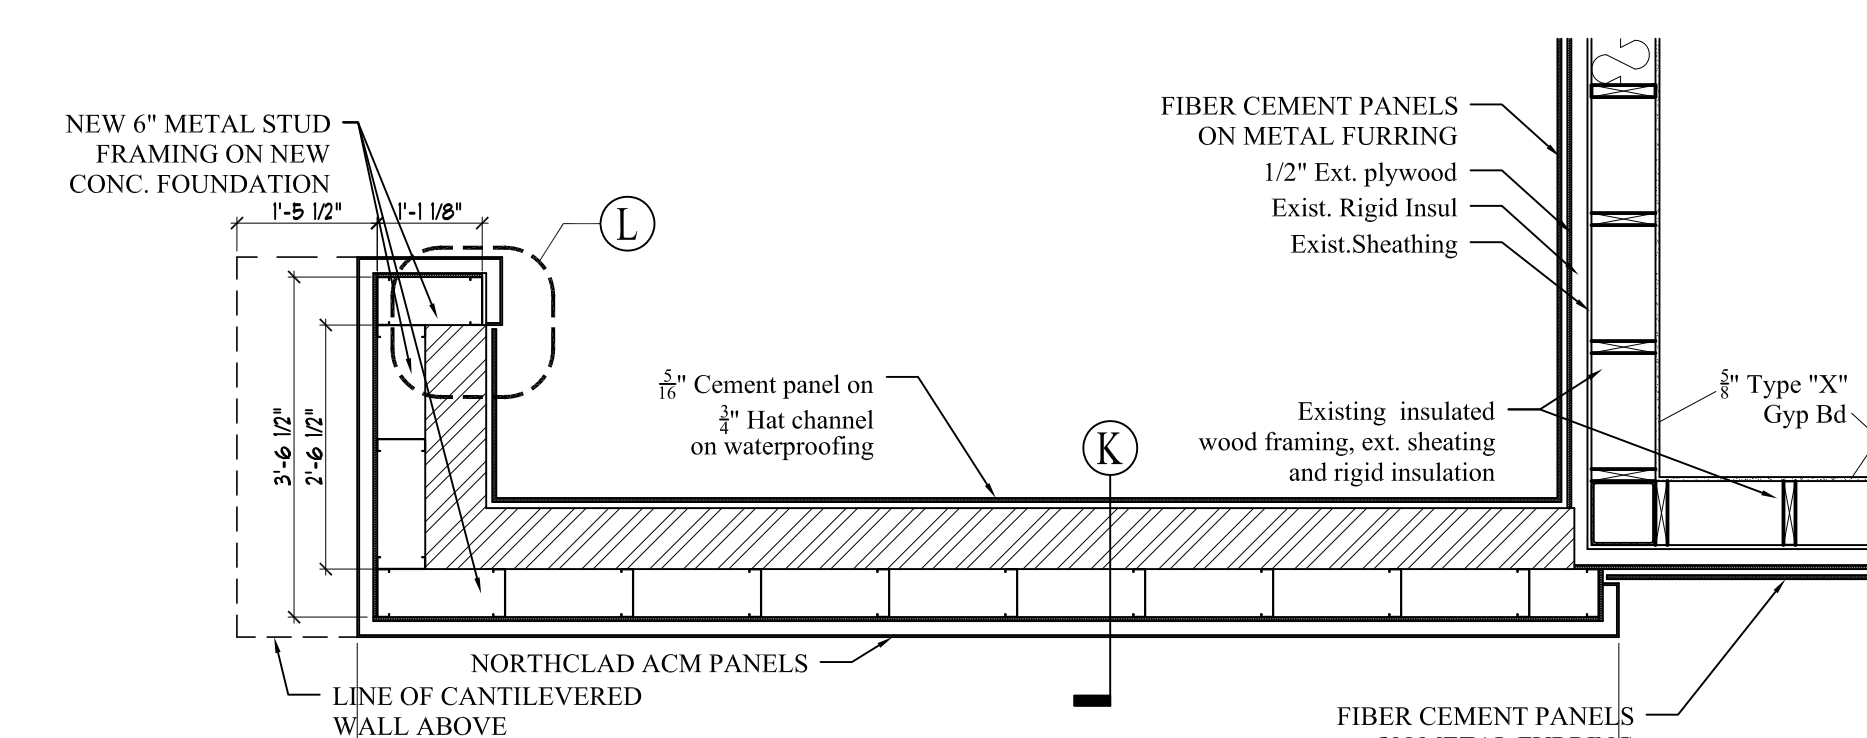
DETAIL M - ALUMINUM SIDING AT CANTILEVER
